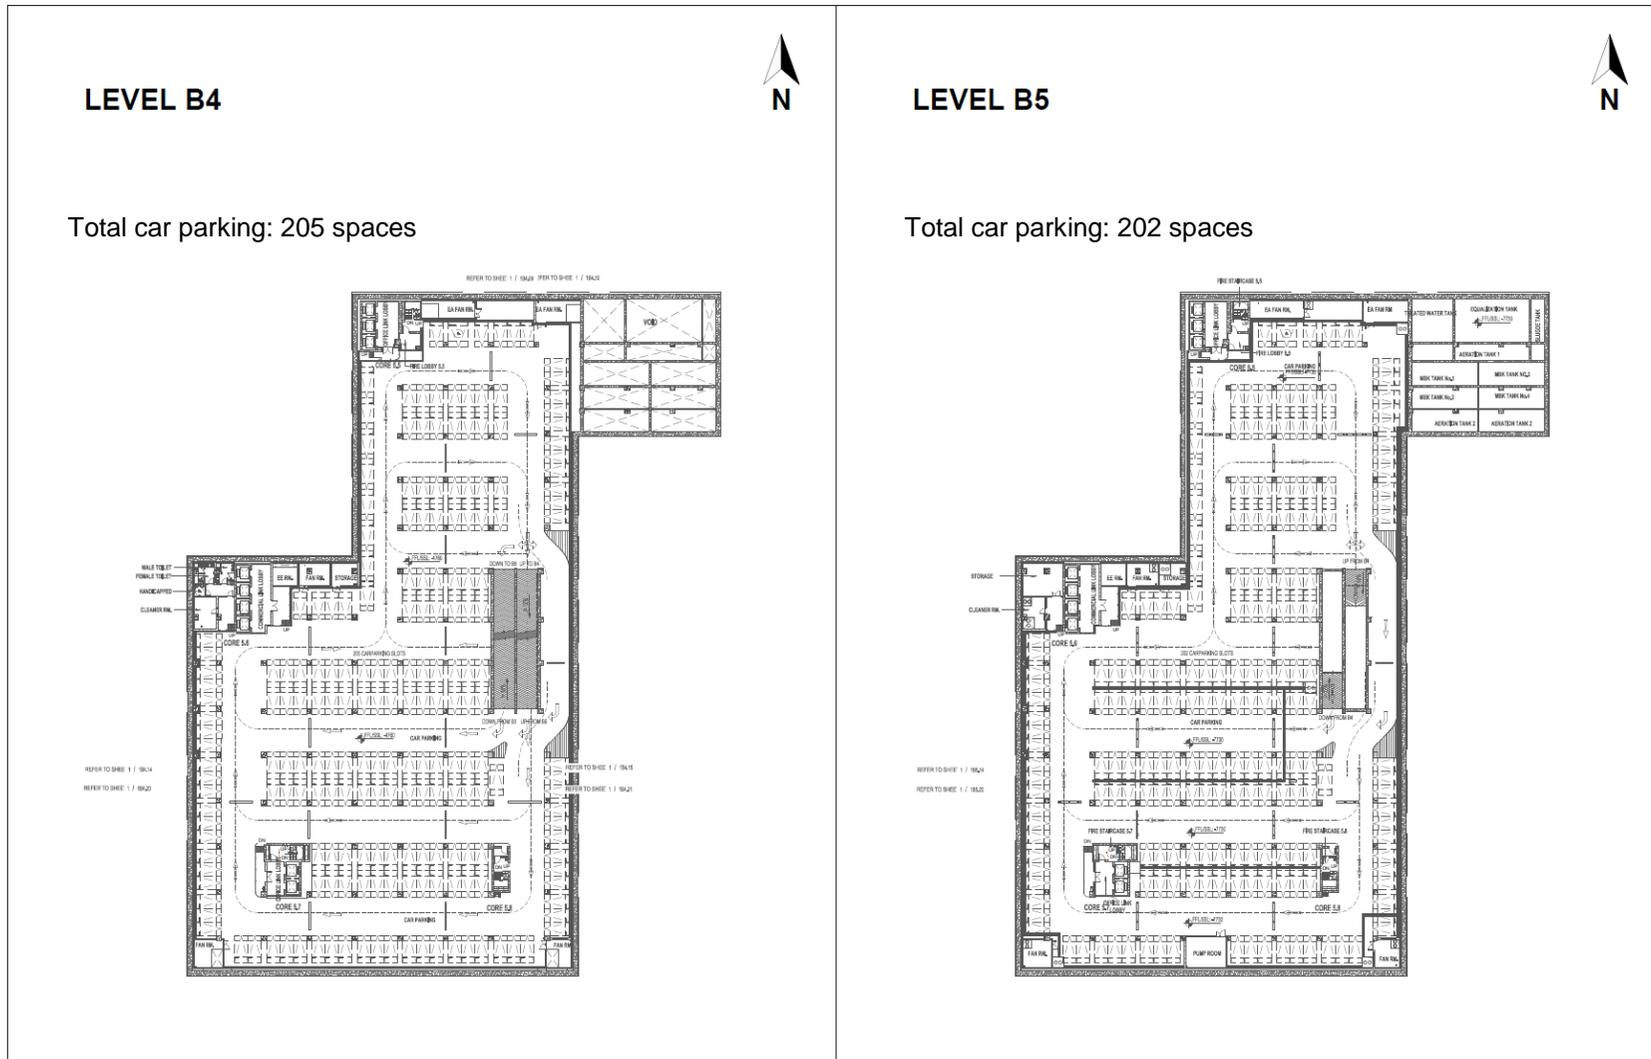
Parking Provision on Basement 4 and Basement 5
